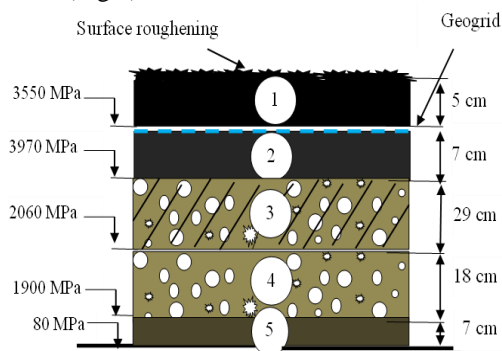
Road pavement structure: 1 – fine-grained asphalt concrete; 2 – coarse-grained asphalt concrete; 3 – crushed stone–sand mixture; 4 – reclaimed asphalt concrete; 5 – coarse-grained sand
